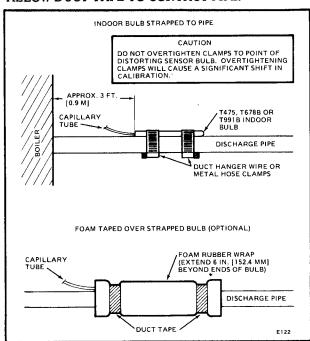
STRAP-ON MOUNTING OF T991B INDOOR BULB ON A BOILER DISCHARGE PIPE.
